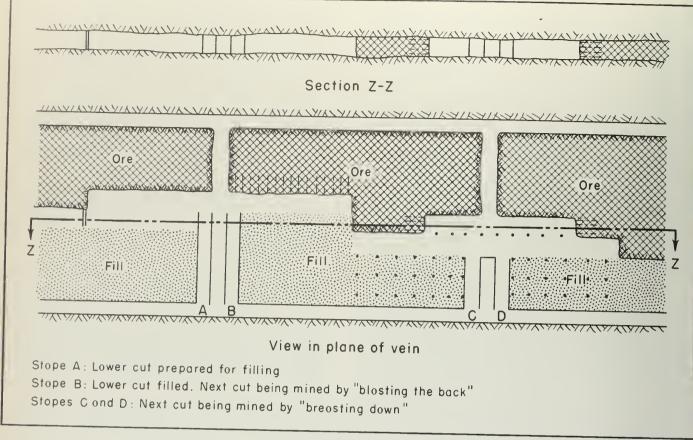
Horizontal cut-and-fill stoping. Two cuts open.
